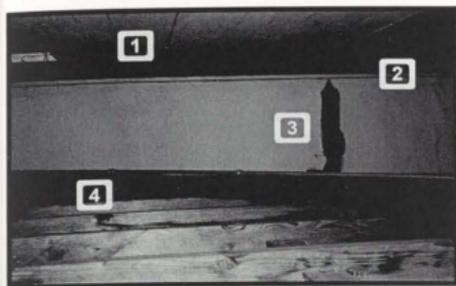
Space between the first and second floors as it appears today, showing (1) the original first floor ceiling, (2) the historic trim, (3) the calcimining, or historic wall finish, and (4) the ceiling joists for the current drop ceiling.
